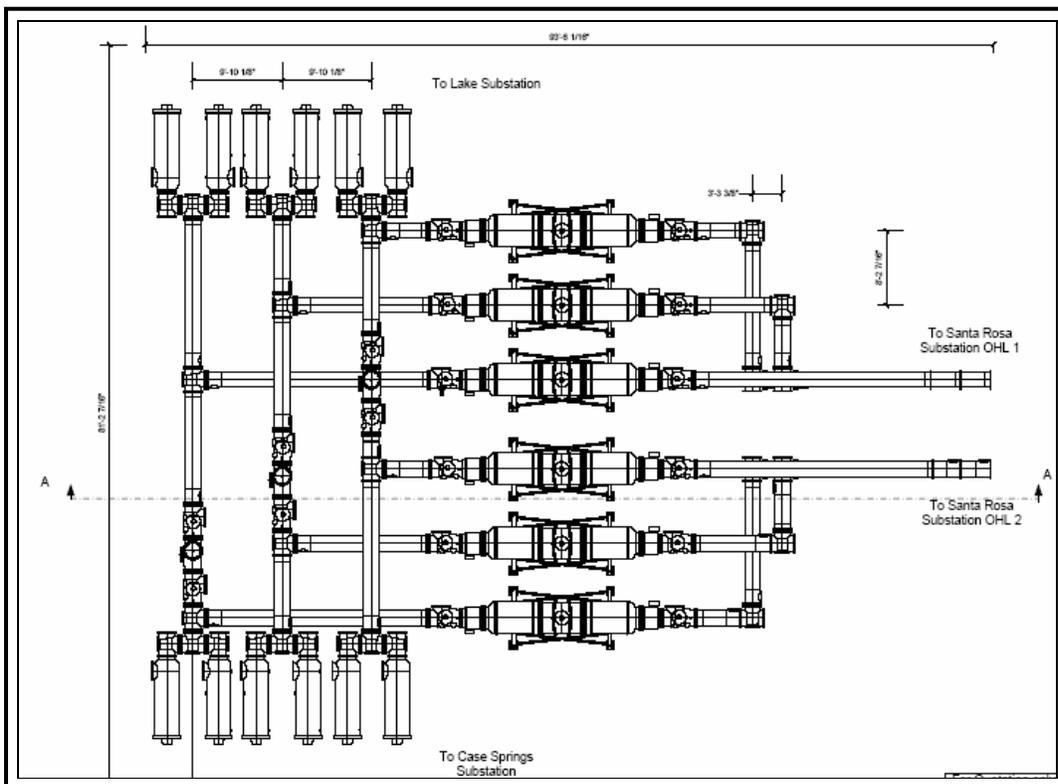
(2 of 2). Alternative Transmission Line Underground Technology Elevation
